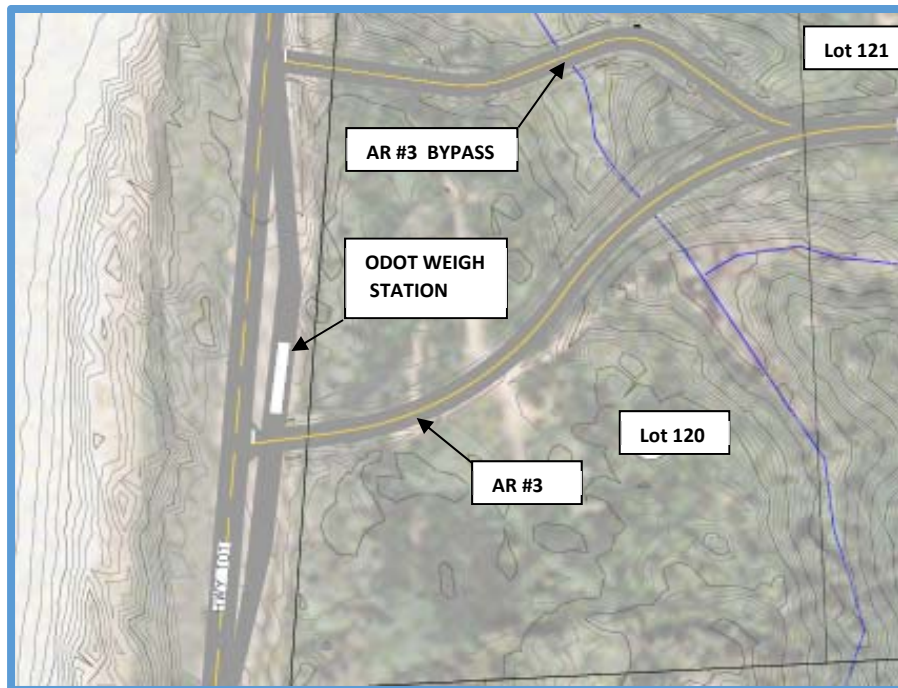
Plan View Highway 101 at Access Road #3 Intersection
